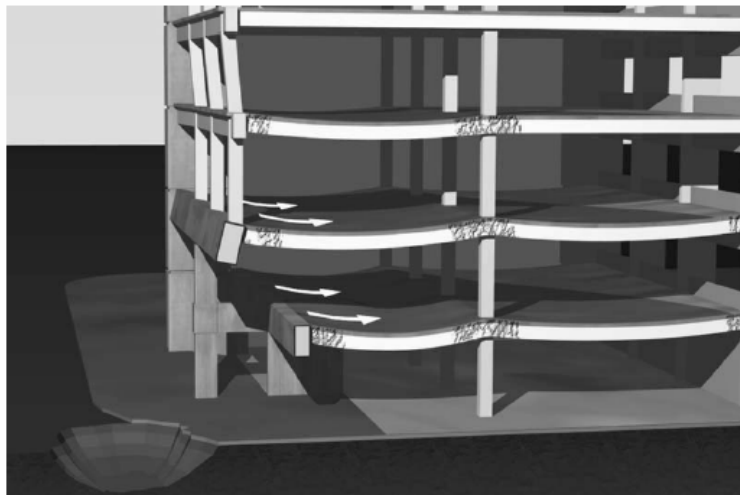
Illustration of catenary action of floor slab and beams following punching shear failure at columns [4]
